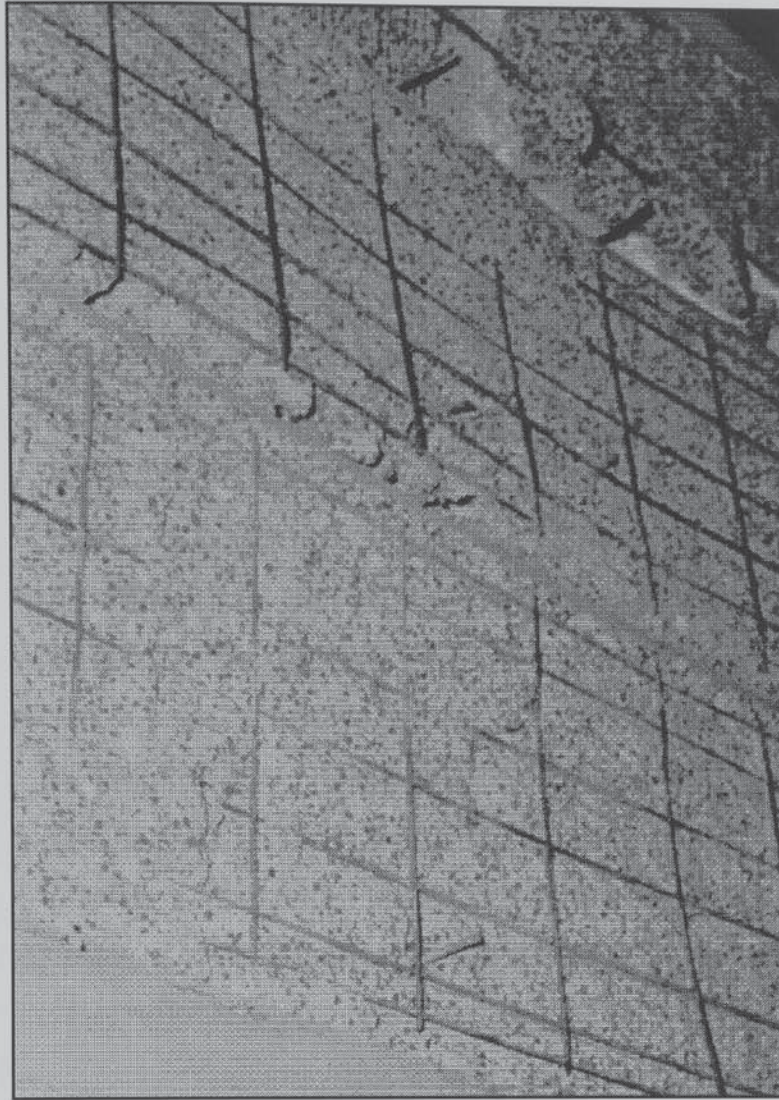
Surface spalling of Lytag concrete slab under real fire conditions
